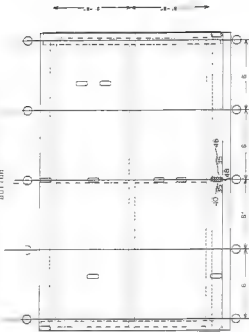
Bottom Cracking Pattern (First Bridge - Test No 3)
